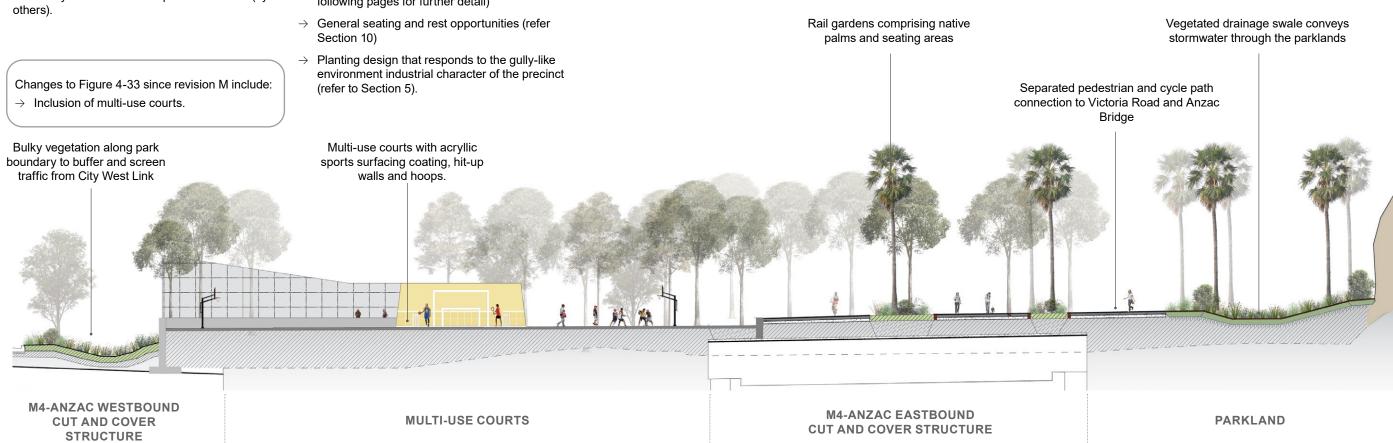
Rozelle Rail Yards - Rail Park - typical section. *Refer Figure 4-12 for revised layout.
